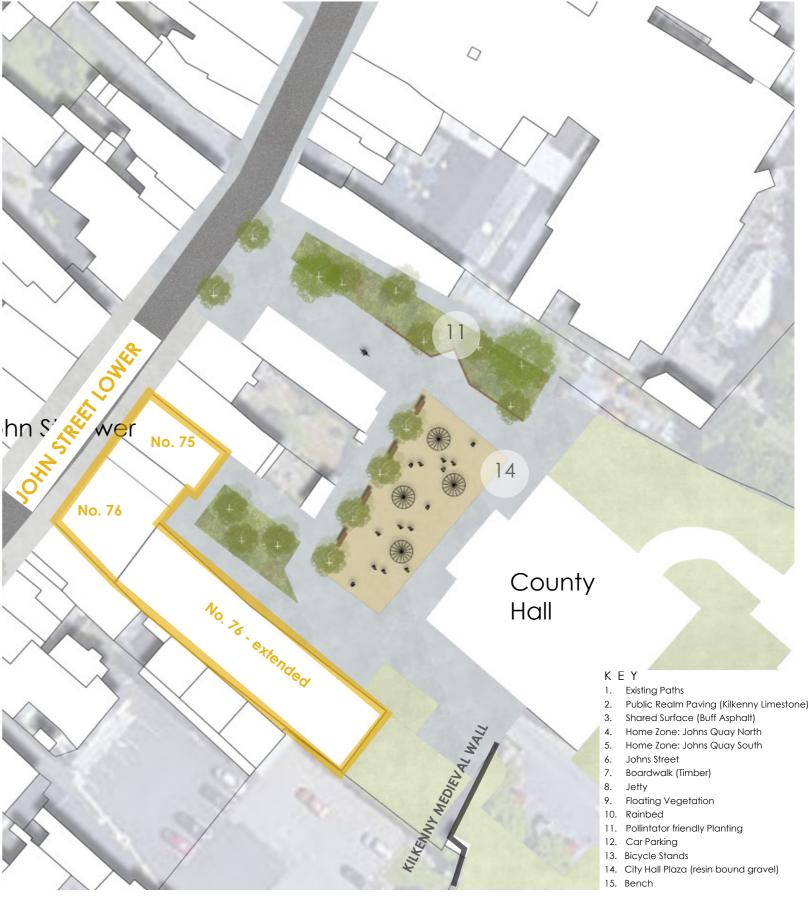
Illustrative site plan of proposed redesign of County Hall plaza overlooked by publicly-owned properties no.75 and 76 John Street outlined in the image.
